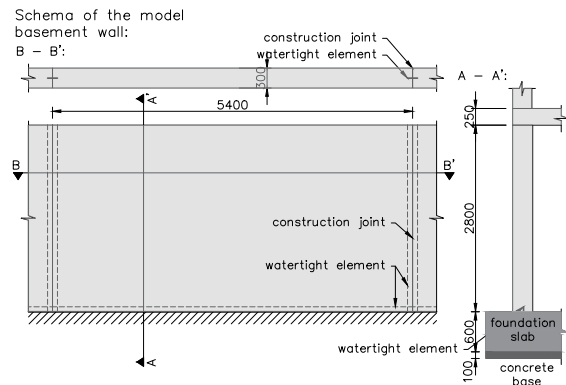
Schema of the model basement watertight wall for the crack width calculation.
